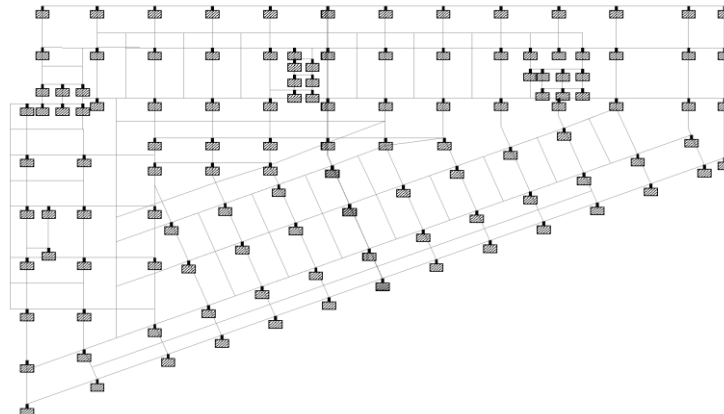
Typical Plan of Commercial Complex (Columns Refer to All Floors)
